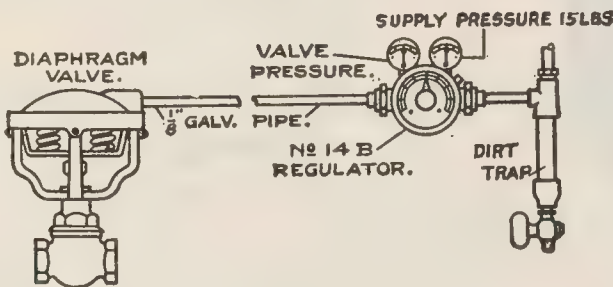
,695.—Assembly of Sturtevant regulator and valves.
